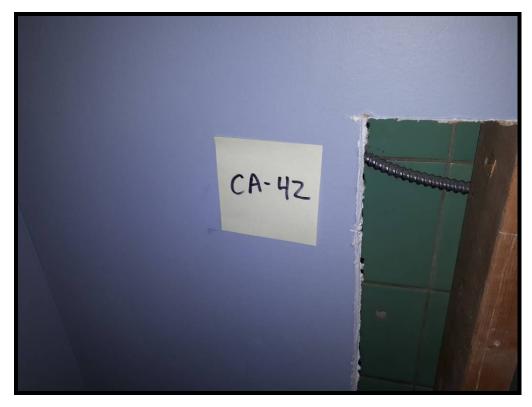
Sample # CA – 42 : Non-asbestos drywall board (walls) located within Office #2 of the Diesel Shop.
